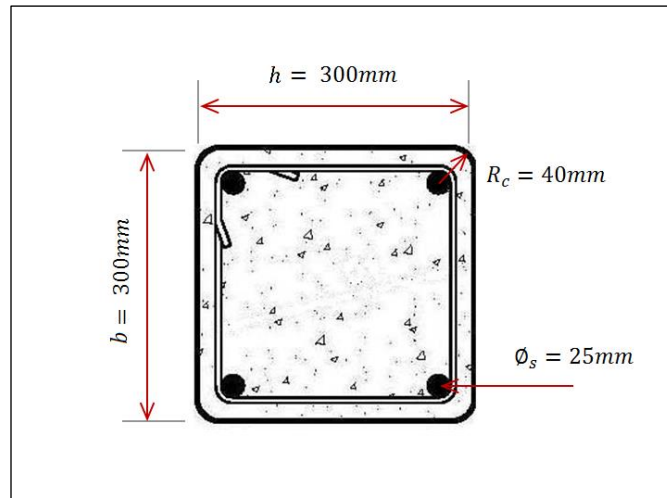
Cross-section dimensions for a medium-scale, concentrically loaded specimen
